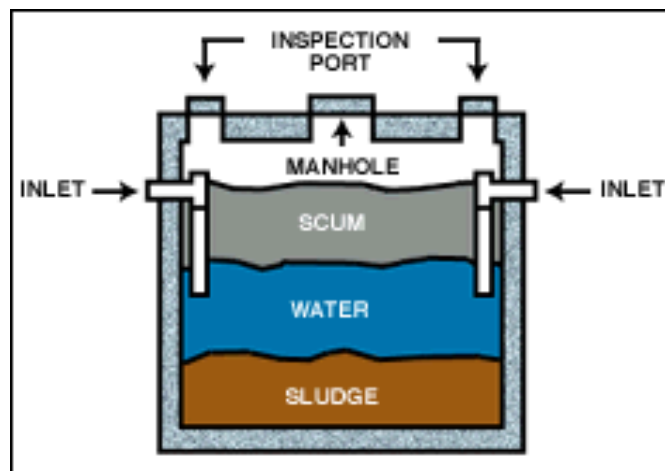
Cross Sectional View of a Typical Septic Tank
